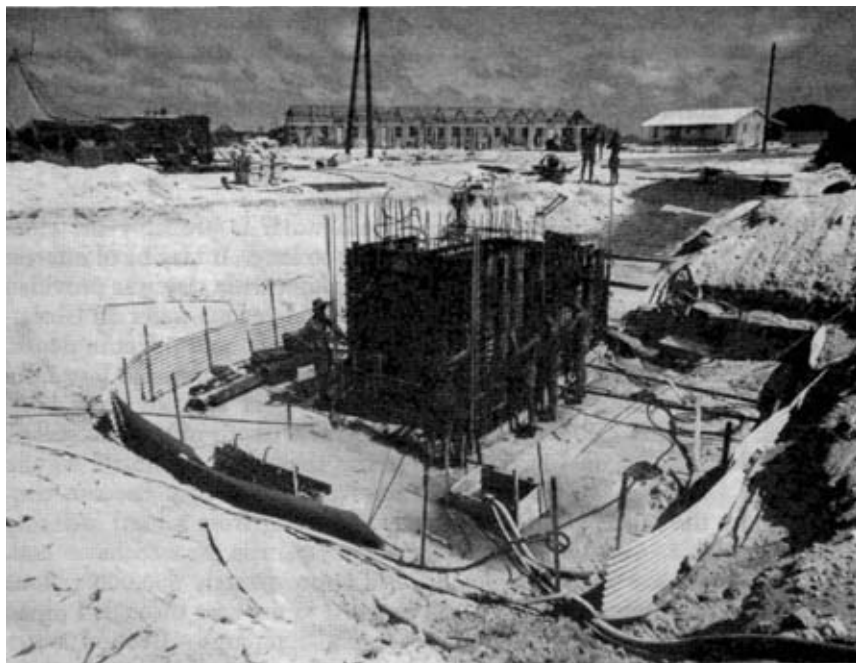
Sappers erecting the reinforcement for a sewage pumping station.
